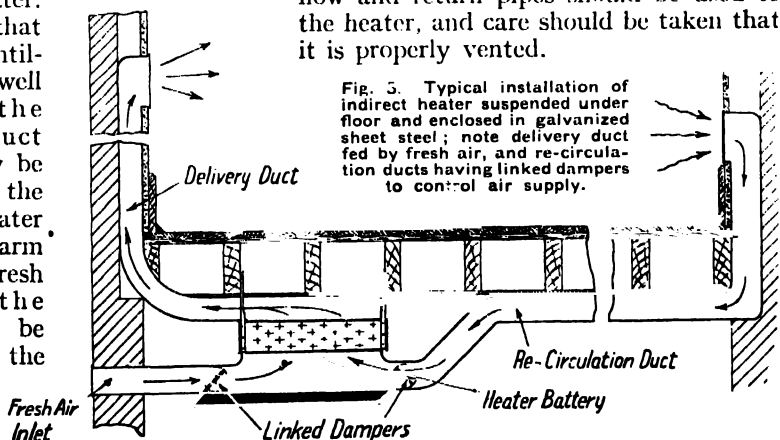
Typical installation of indirect heater suspended under floor and enclosed in galvanized sheet steel; note delivery duct fed by fresh air, and re-circulation ducts having linked dampers to control air supply.
